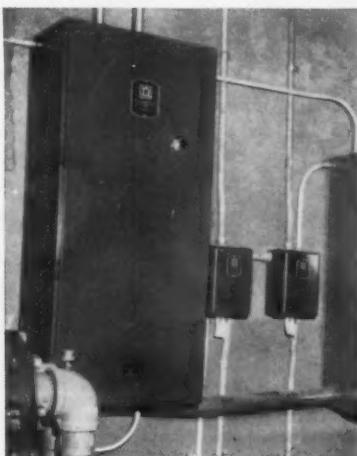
Motor controllers are wall-mounted in church electrical equipment room.
